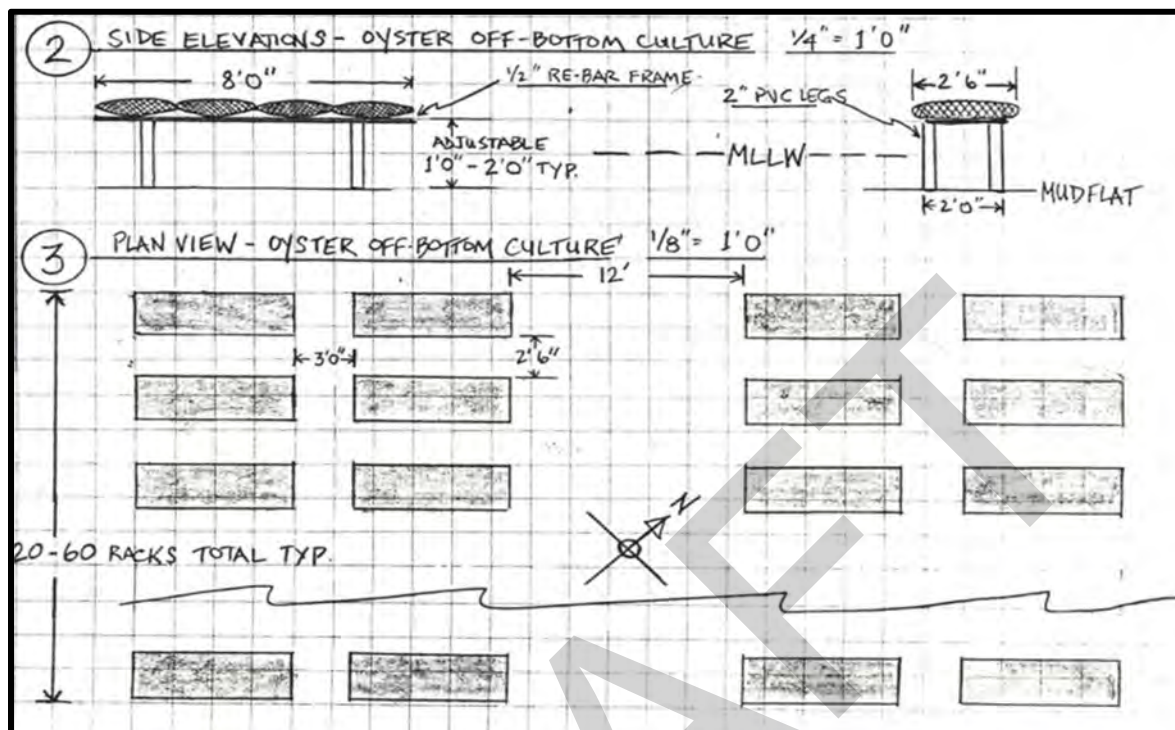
Typical Off-Bottom Racks-on-Pipe Layout
